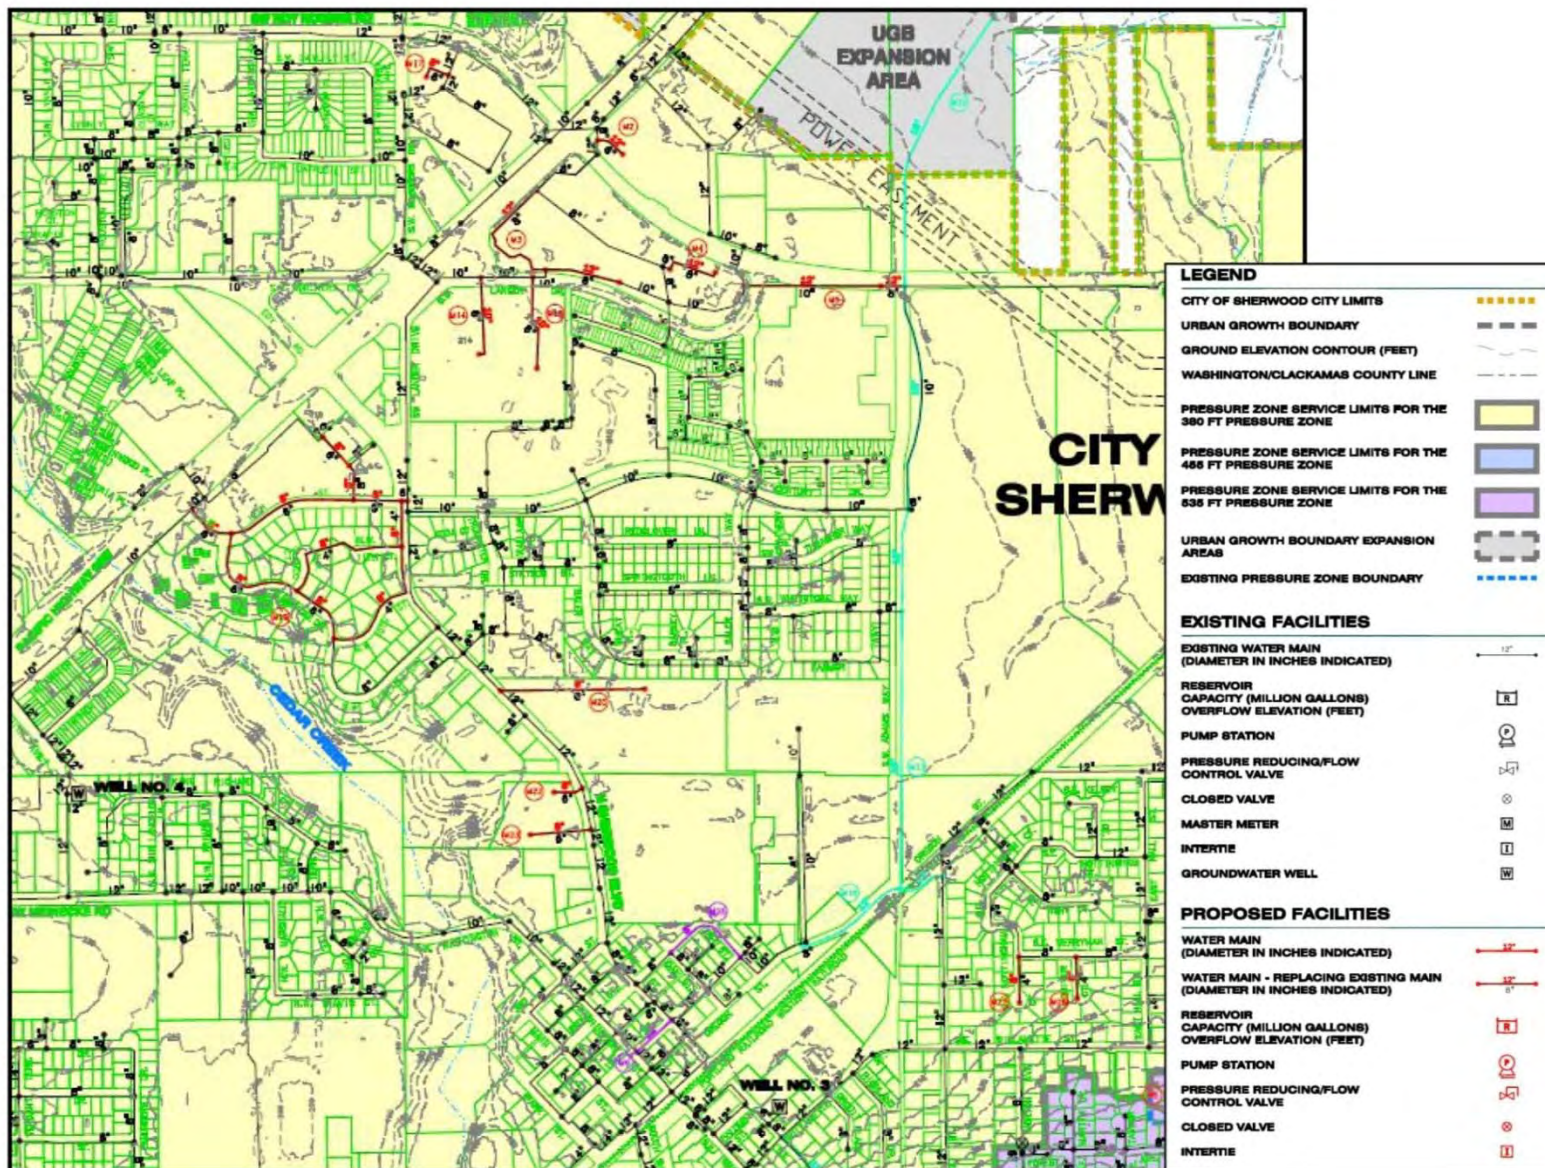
Water System Master Plan Map (Project Study Area section only)
